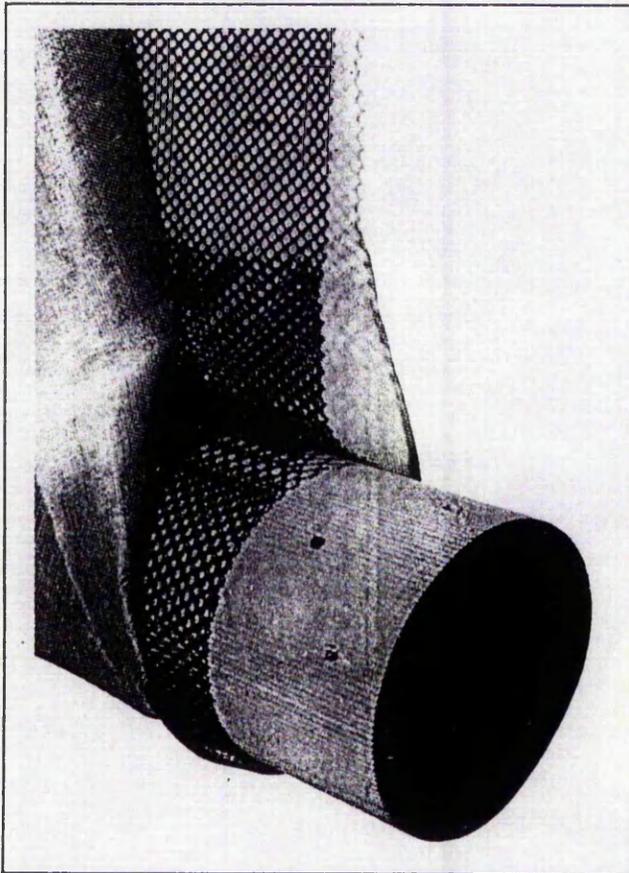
Cross-section of typical design for a 'fin drain'.
